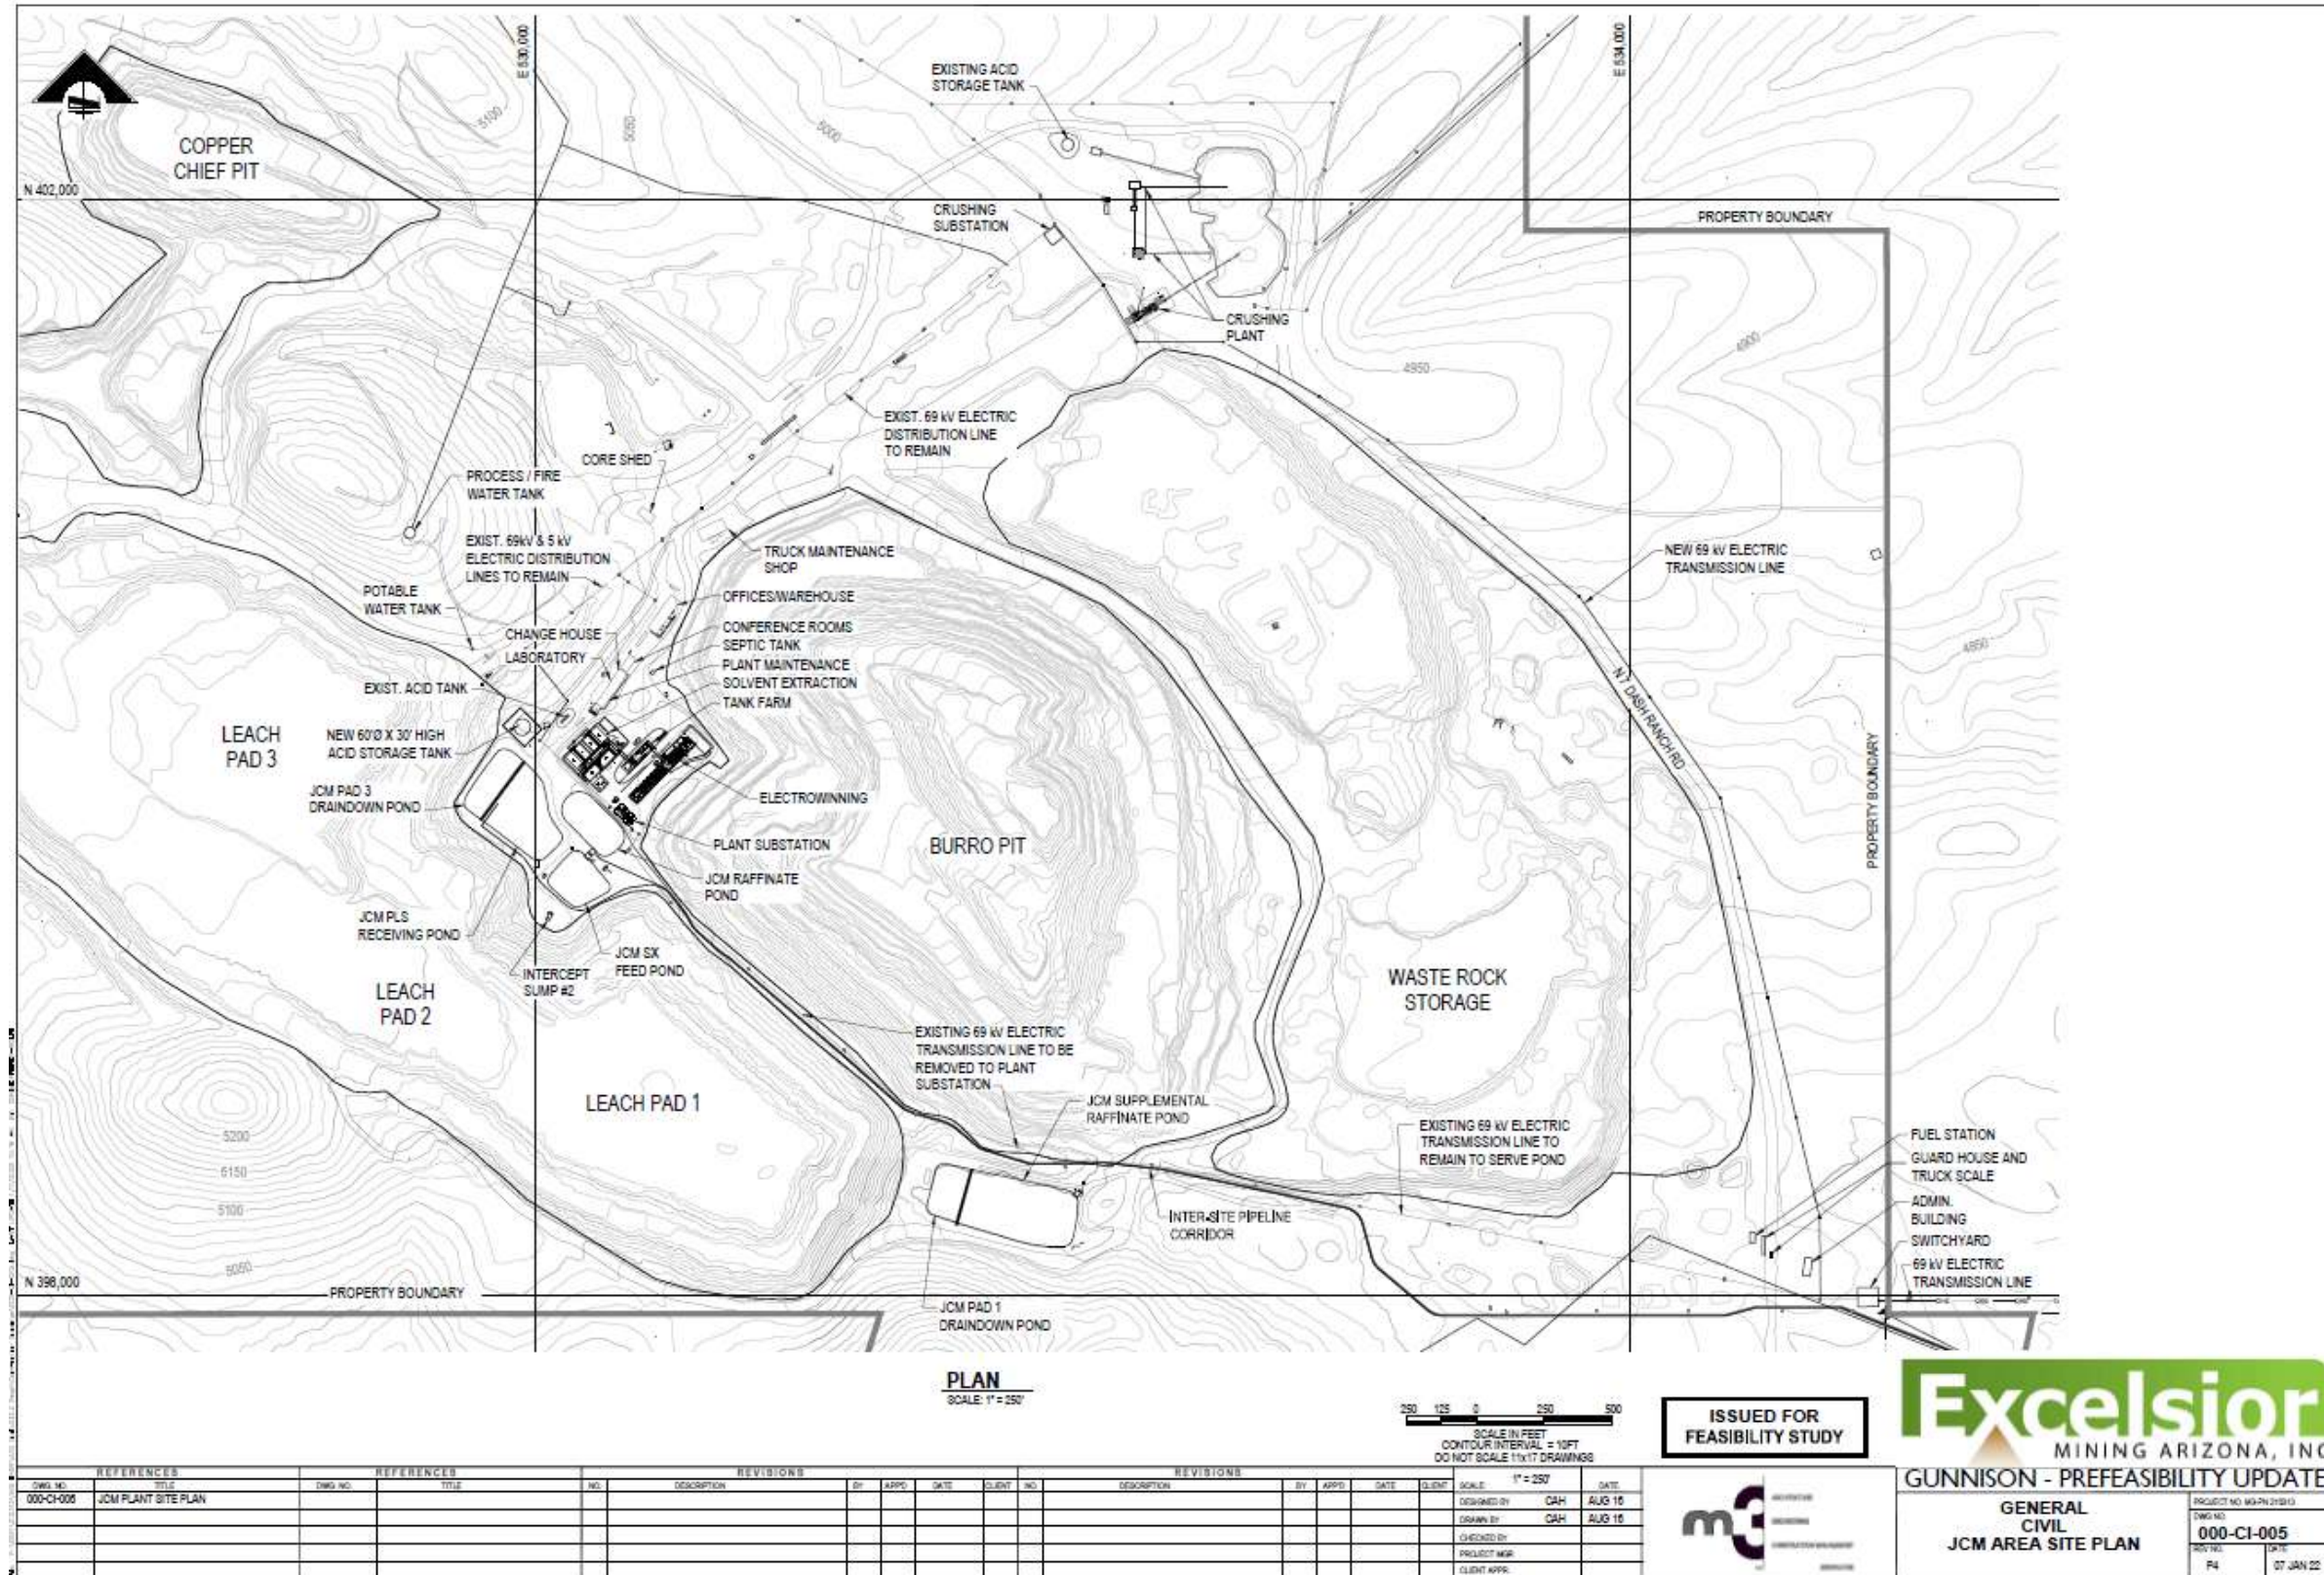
Johnson Camp Mine Facilities Arrangement
